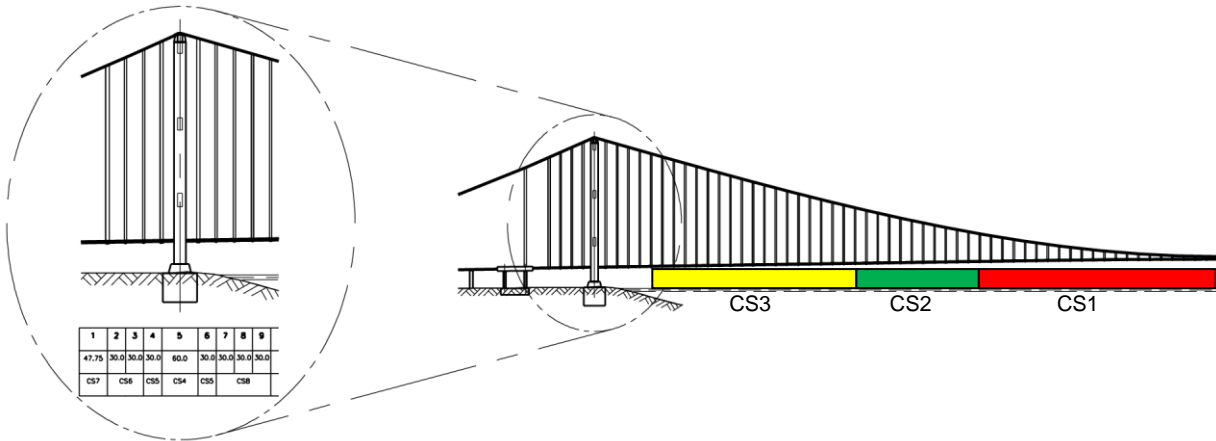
Distribution of the cross sections for the roadway girder throughout the bridge
